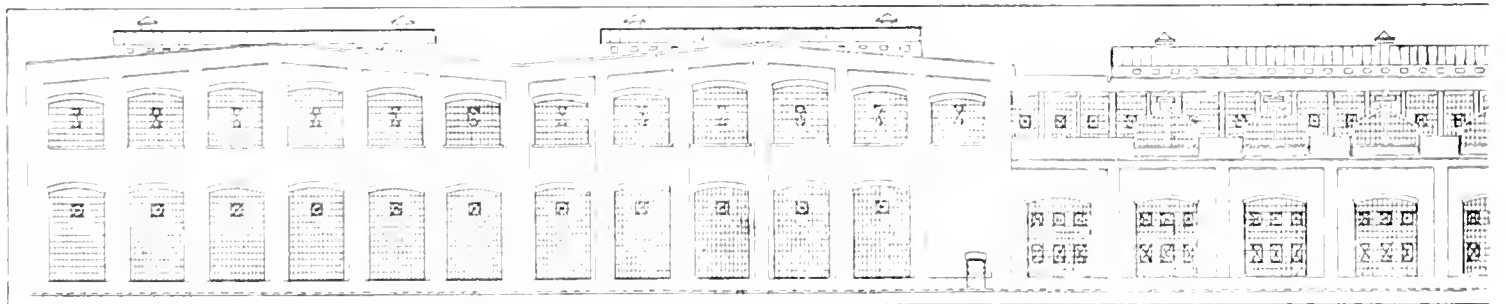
Side Elevation of Steel Car Shop (see opposite page).
